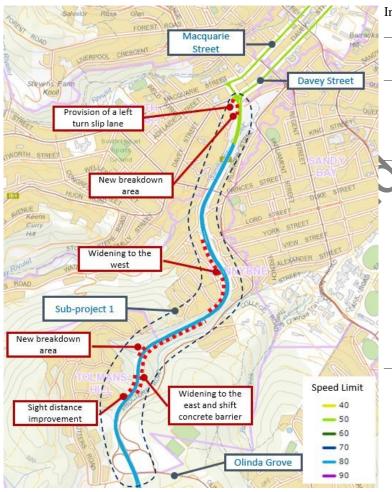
Southern Outlet Sub-Project 1 proposed works overview
